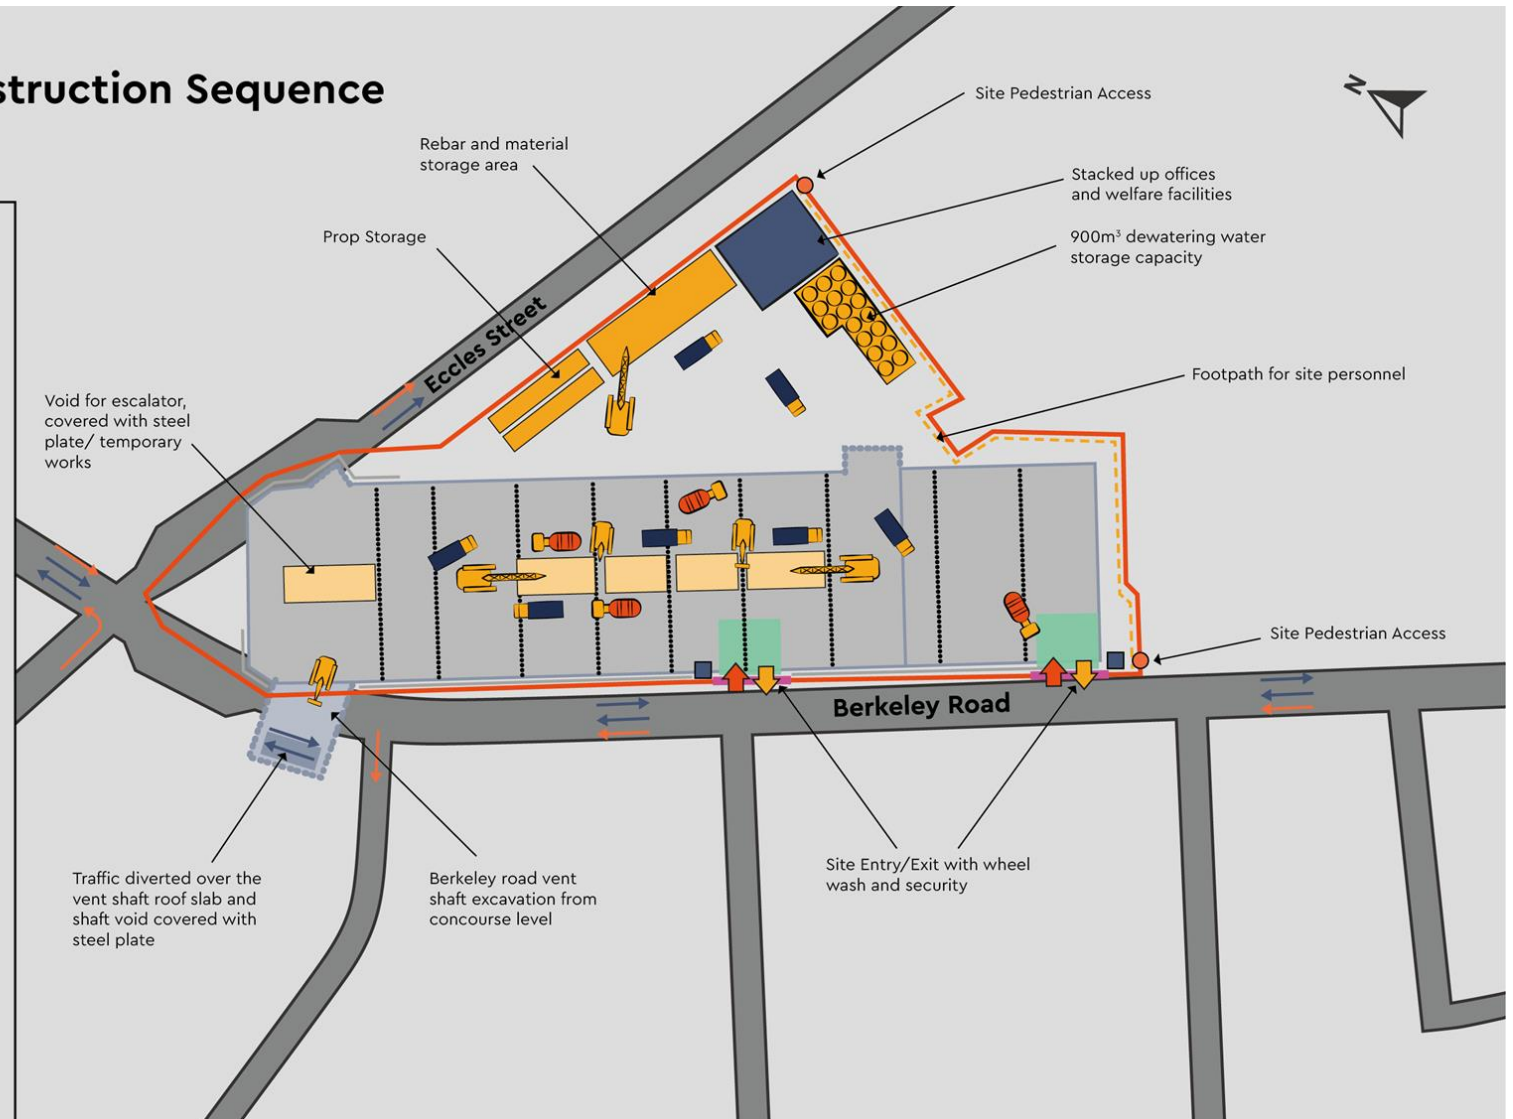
Mater Station Stage 6 – Station Void Fit-out
